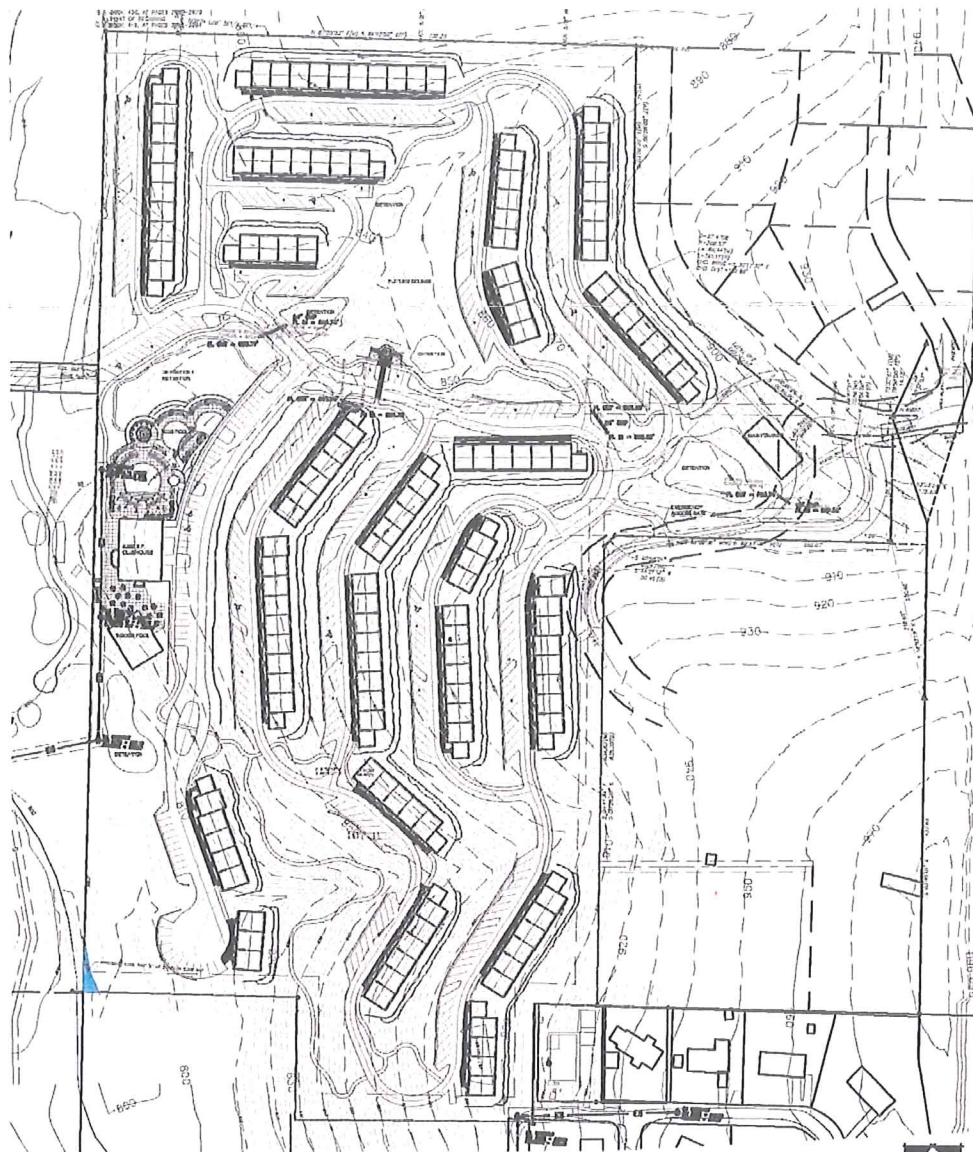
SIDEWALK AND TRAIL PLAN
